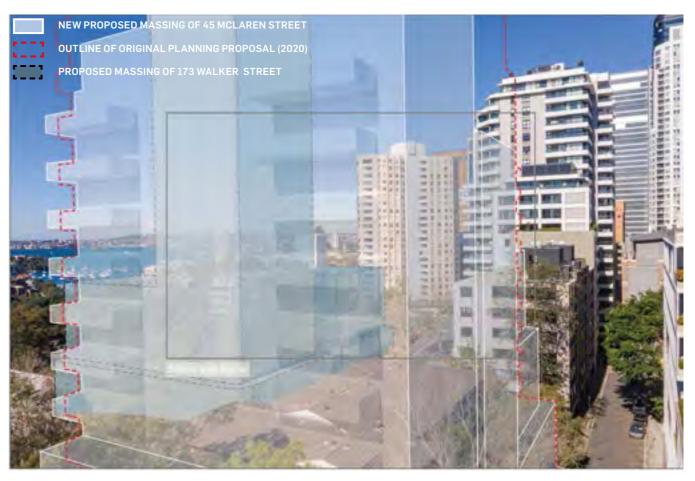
PHOTOMONTAGE INDICATING PROPOSED INDICATIVE BUILDINGS
